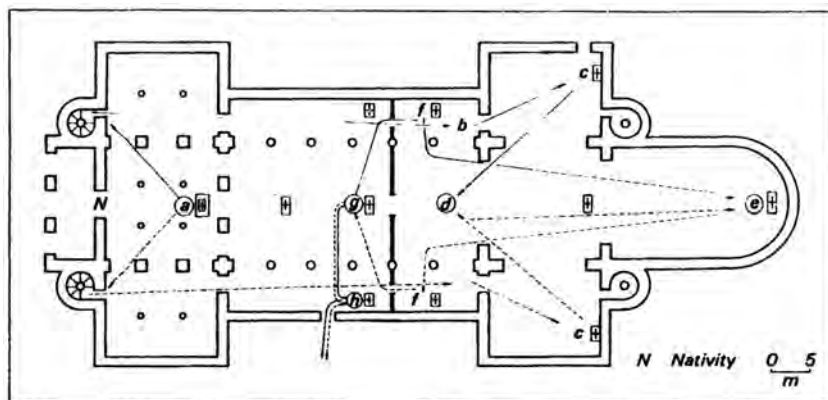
Saint-Riquier : reconstructed plan (*courtesy Dr. H. M. Taylor and Macmillan Publishers Ltd.*).
